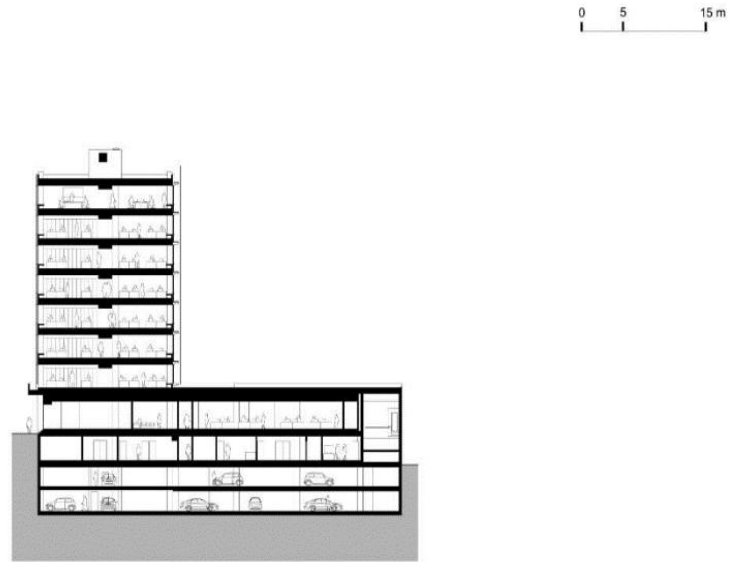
Sectional View Showing Underground Parking of Telecom Office Building, Portugal
